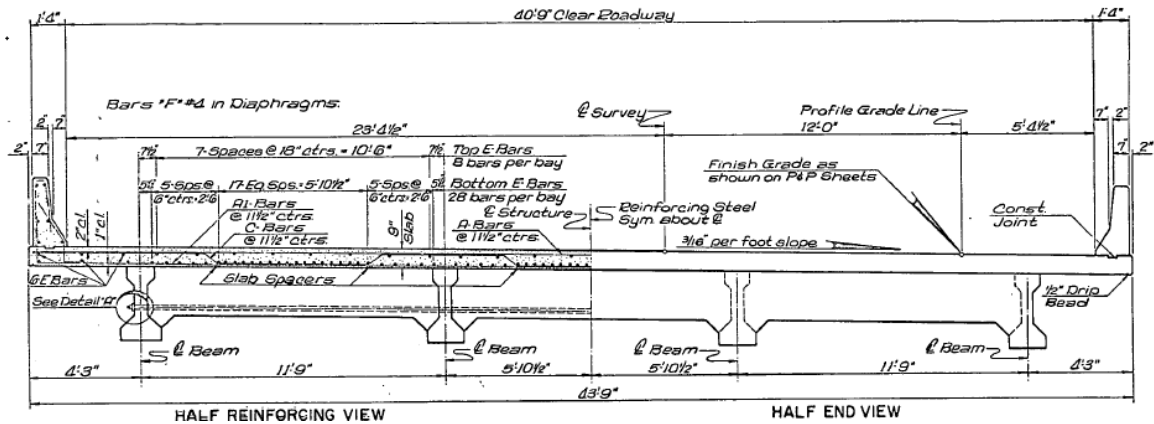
Cross Section of P/S I-Beam Bridge
